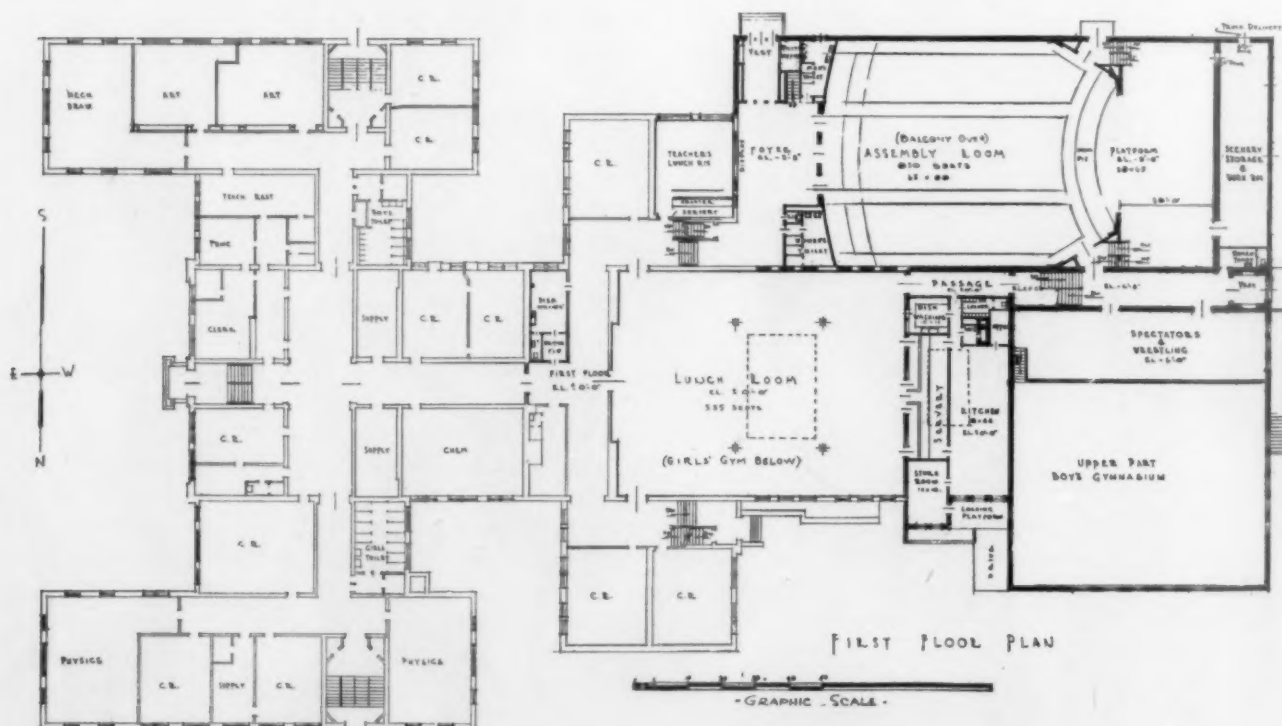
Glenville High School, first floor plan after rehabilitation and addition
